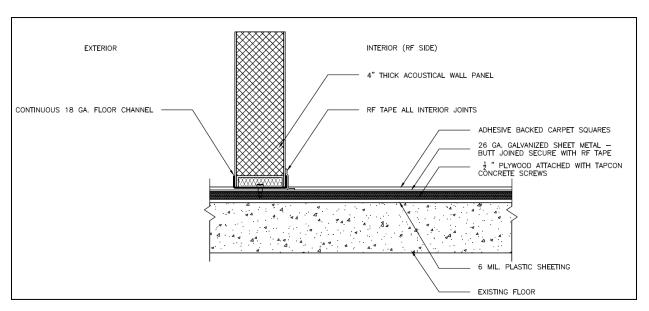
Fabrication details: typical floor isolation fabrication technique. (Adapted from Noise Barriers, LLC, 2011.)
